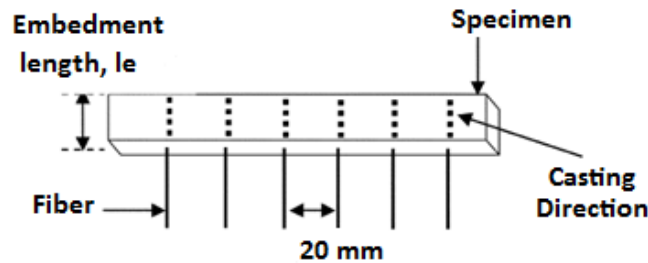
Pullout specimen casting method used by Rathod & Patodi, 2010
